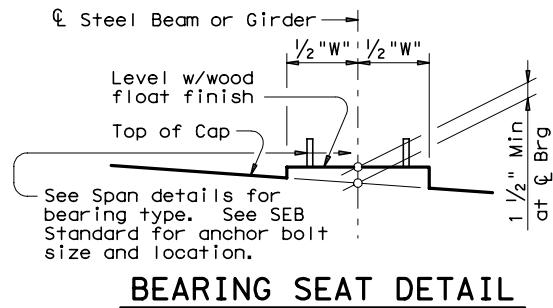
Typical (SE) Bearing Seat Detail. Online users can click 6-11 to view this illustration in PDF.
